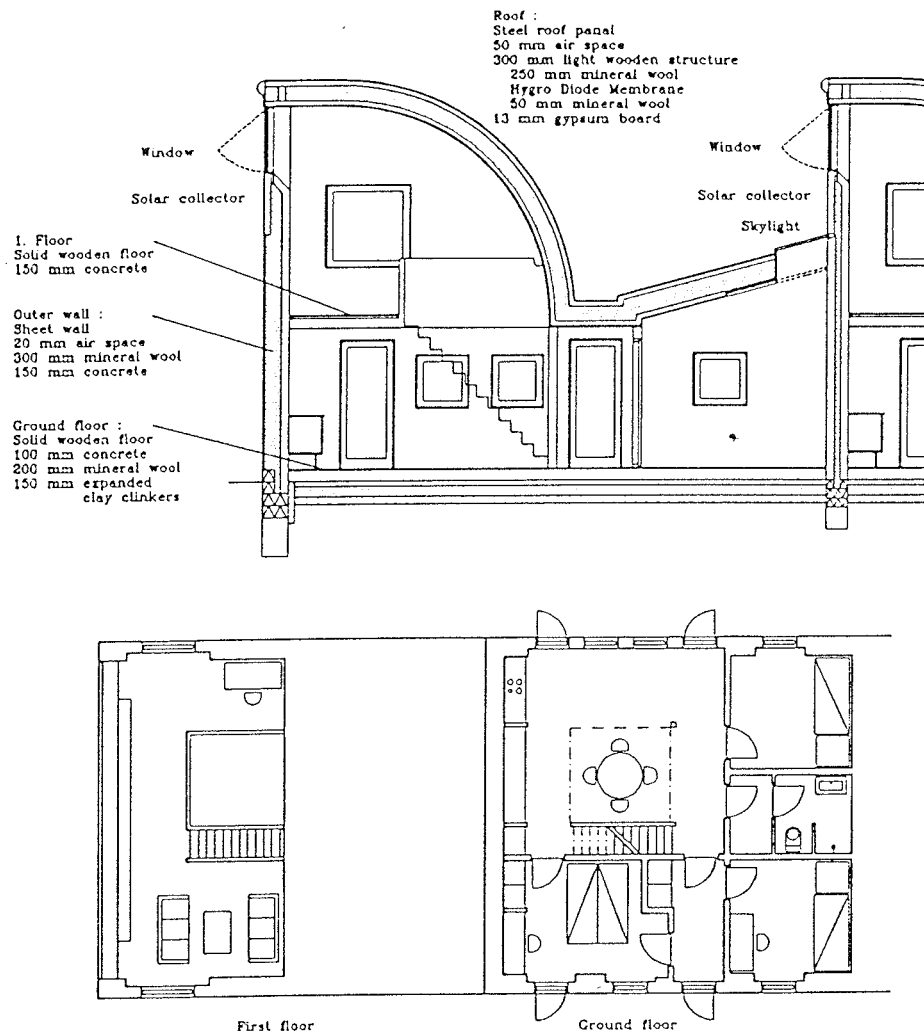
Plan and section of House type B. The plan shows 2 dwellings of a longer row, the ground floor of one unit to the right, and the top floor of the neighbour unit to the left.
